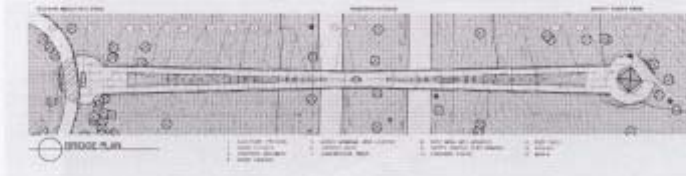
Henderson Crossing Pedestrian Bridge - Plan View
